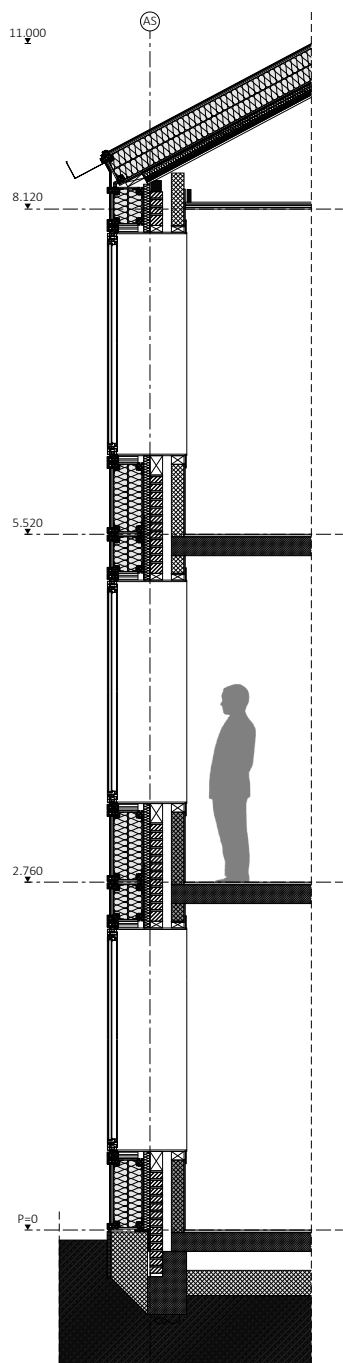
Section | 1:60 | Vertical | South Facade (own illustration).
